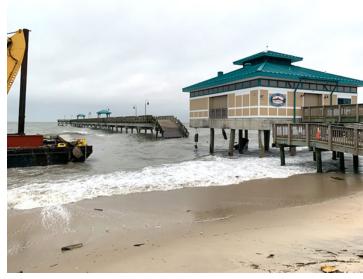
The damaged fishing pier with debris on the deck of the *YD 71*.
